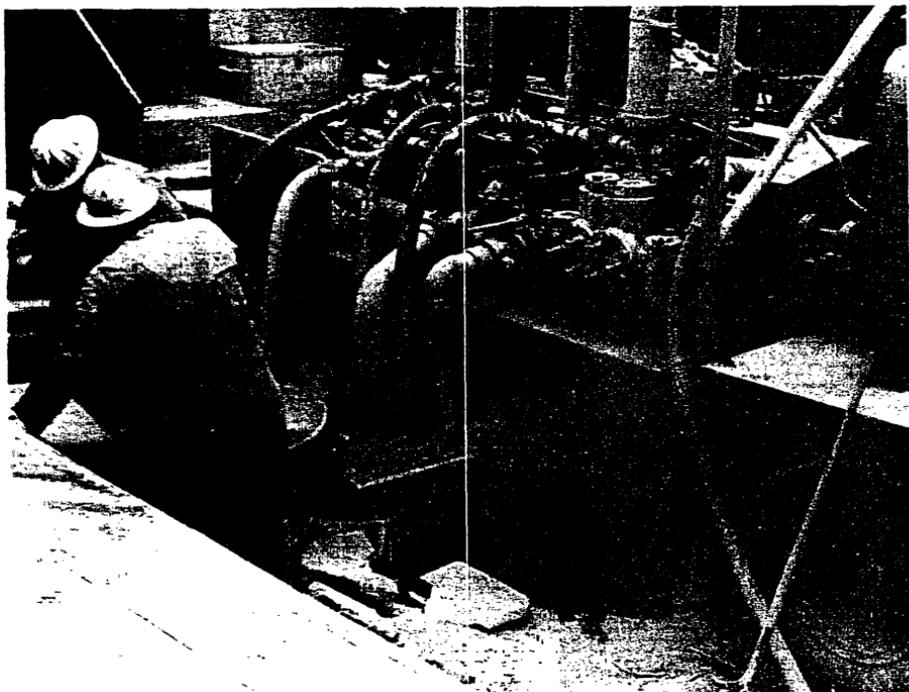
Photograph showing trailer-mounted cement-grout pump. Two men feed cement to mixing box where water is added.
